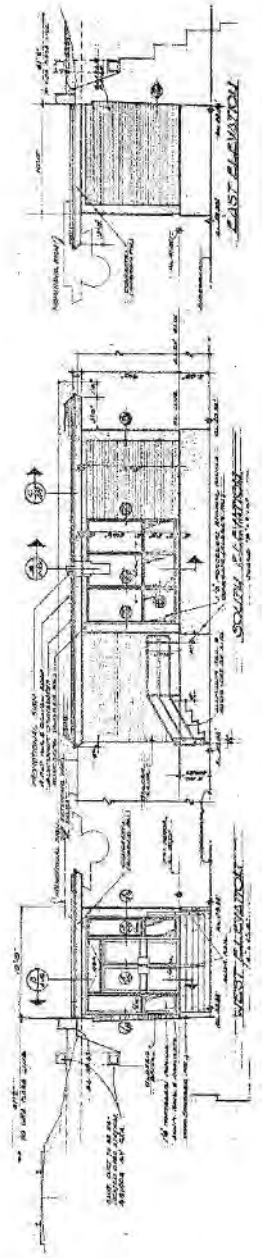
Excerpt from historical drawings of the Mason (auxiliary) Stationhouse exterior elevations, 1961. Courtesy of the CTA.
